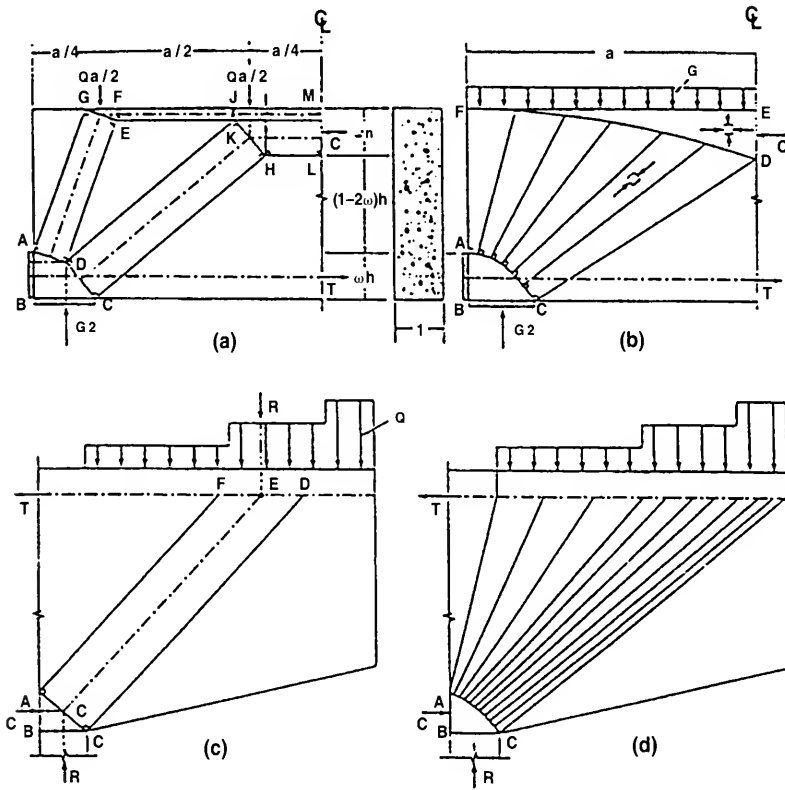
B. Fan action: (a) Strut-and-tie model of uniformly loaded deep beam; (b) Fan-shaped stress field; (c) Strut-and-tie system for equivalent single load  $R$  replacing distributed load  $q$ ; (d) Continuous fan developed from discrete strut.\
